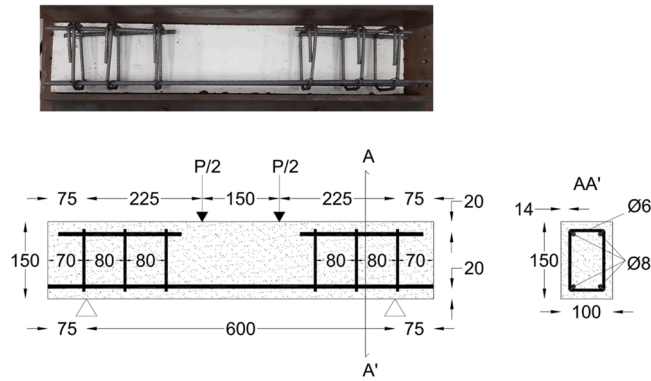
Geometry (in mm) and reinforcement details of short beams.
